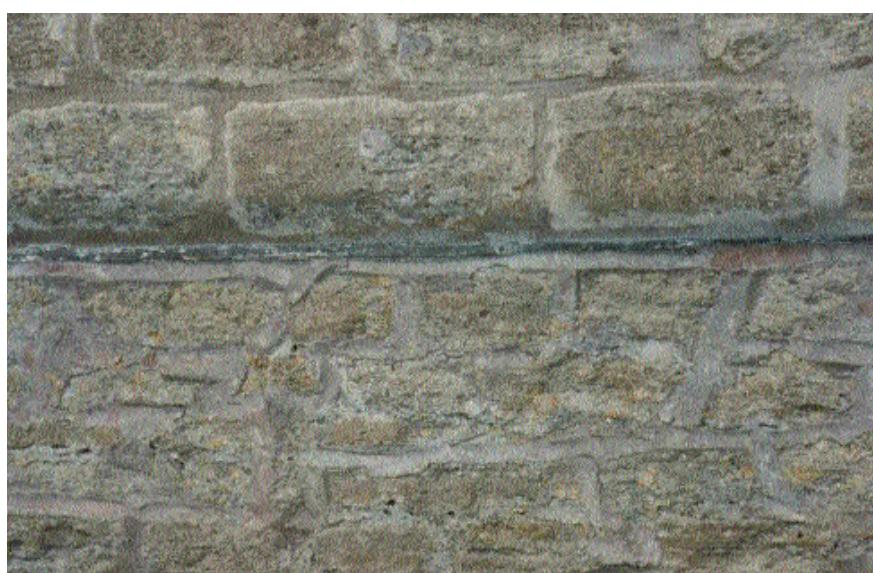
A slate DPC about 20 mm thick with half lap joints in a house built in the 1870s; it is still in excellent condition
